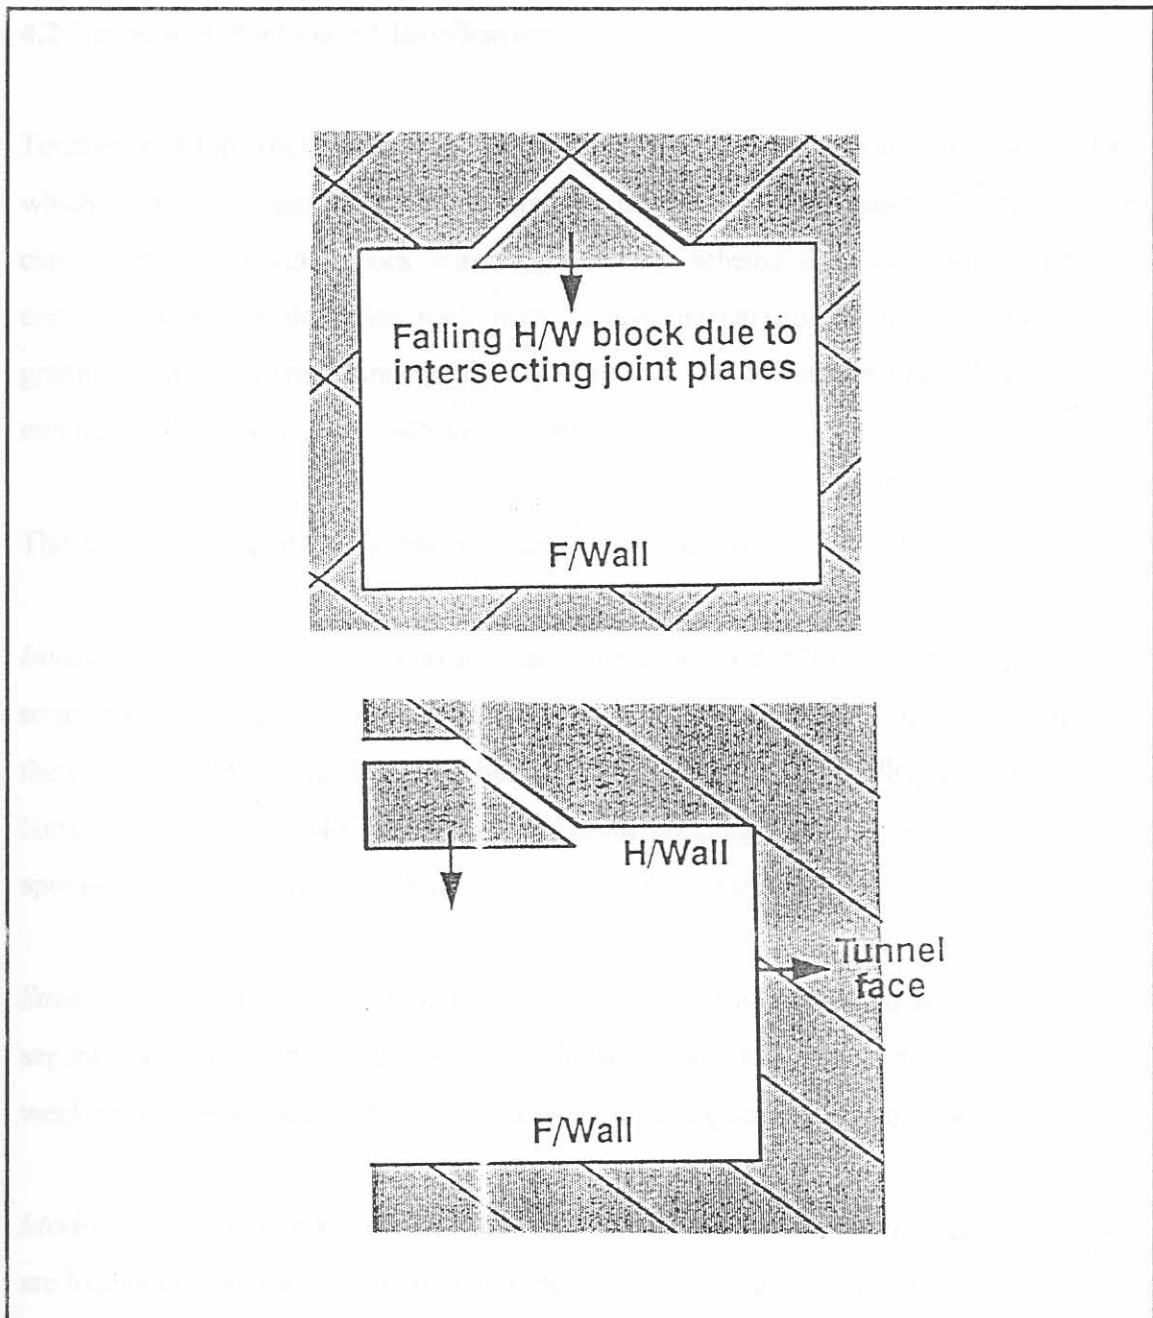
Potential unstable hangingwall block (After SIMRAC, 1994)
